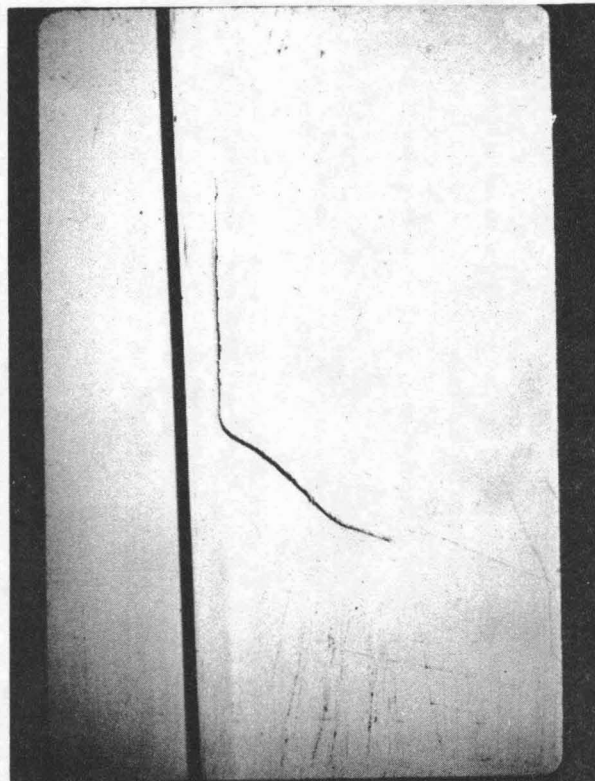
Final Appearance, Crack 3, Girder F5
